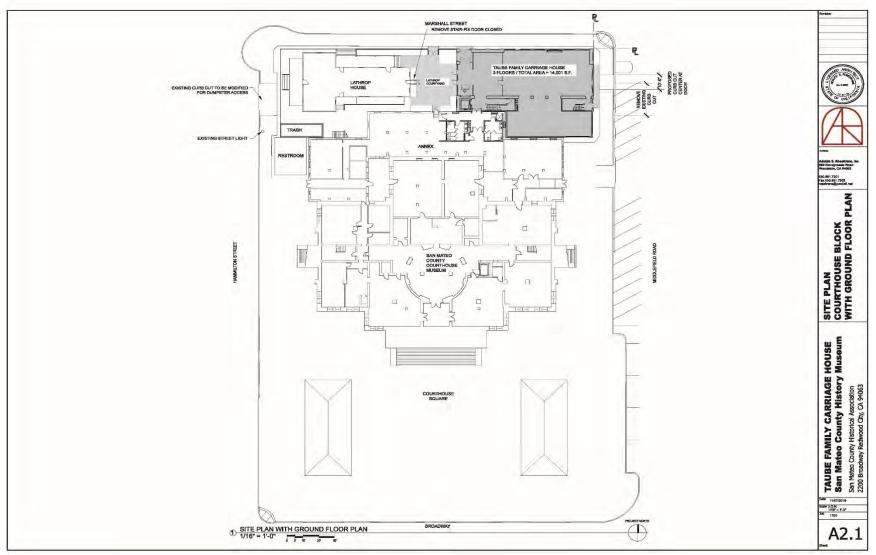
Project site plan showing the block bounded by Marshall Street on the north, Hamilton Street on the west, Middlefield Road on the east, and Broadway on the south. The plan also shows the current buildings on the block including the Lathrop House in the northwest corner (upper left) and the footprint of the proposed carriage house addition (shaded area) in the northeast corner of the block (upper right). (Plans by Adolph S. Rosenkrans, Inc.)
